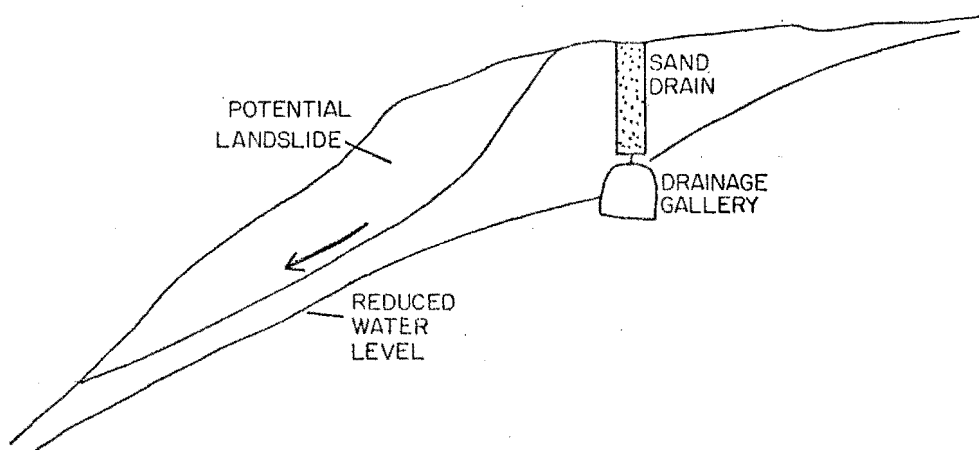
FIG. g: DRAINAGE GALLERY AND VERTICAL SAND DRAIN
